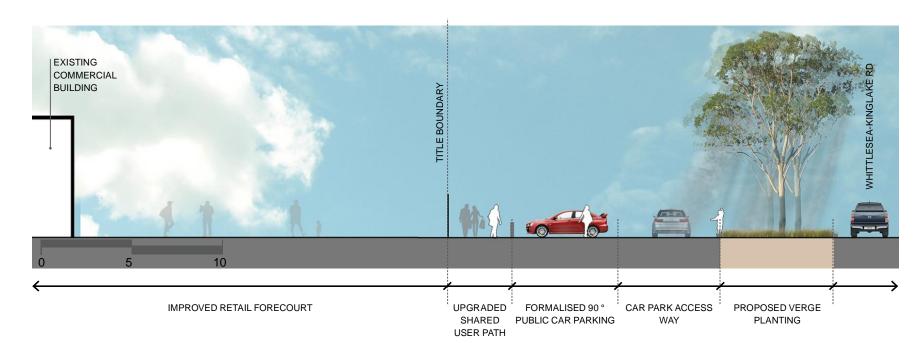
Kinglake West - Pheasant Creek proposed streetscape typical section
